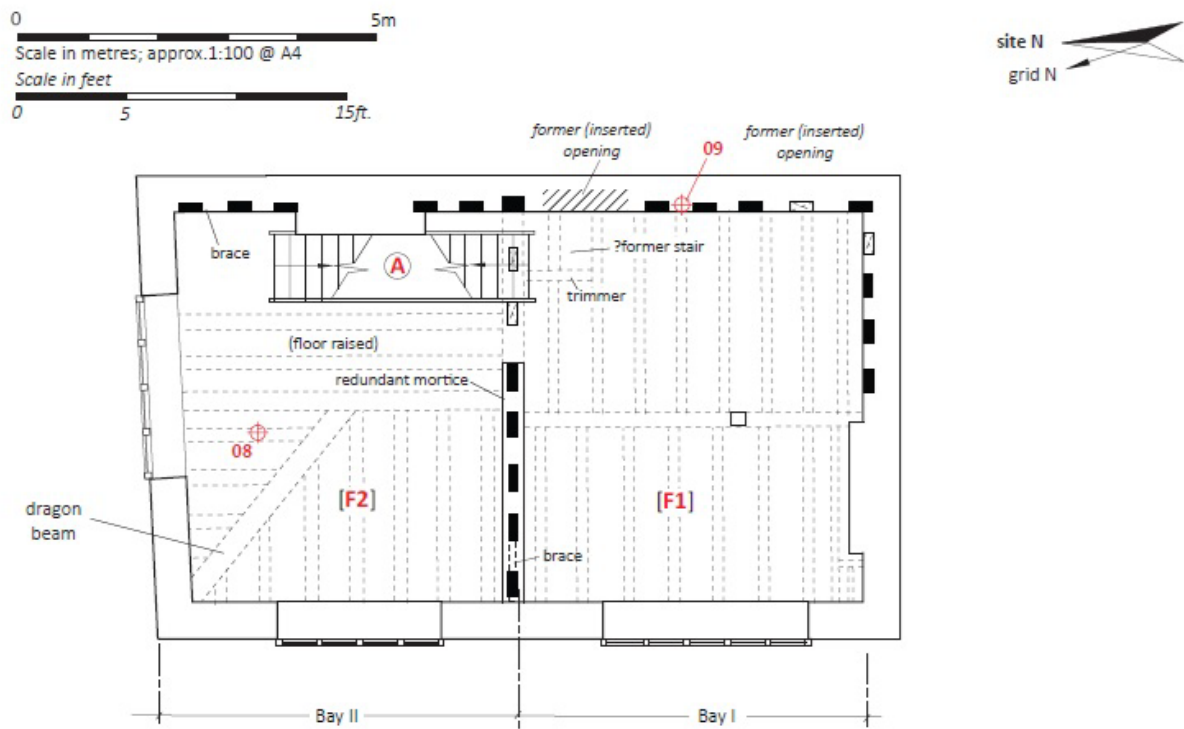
First-floor plan showing the location of two samples taken for dendrochronology [adapted from an original drawing by Ric Tyler]
